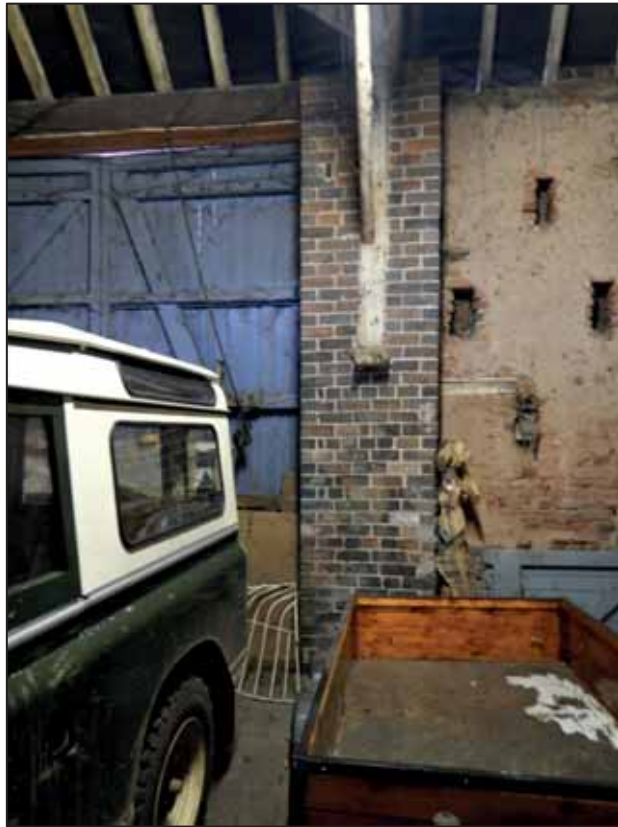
Main Barn, south wall showing principal post bricked in to later brick door jamb. looking S.
